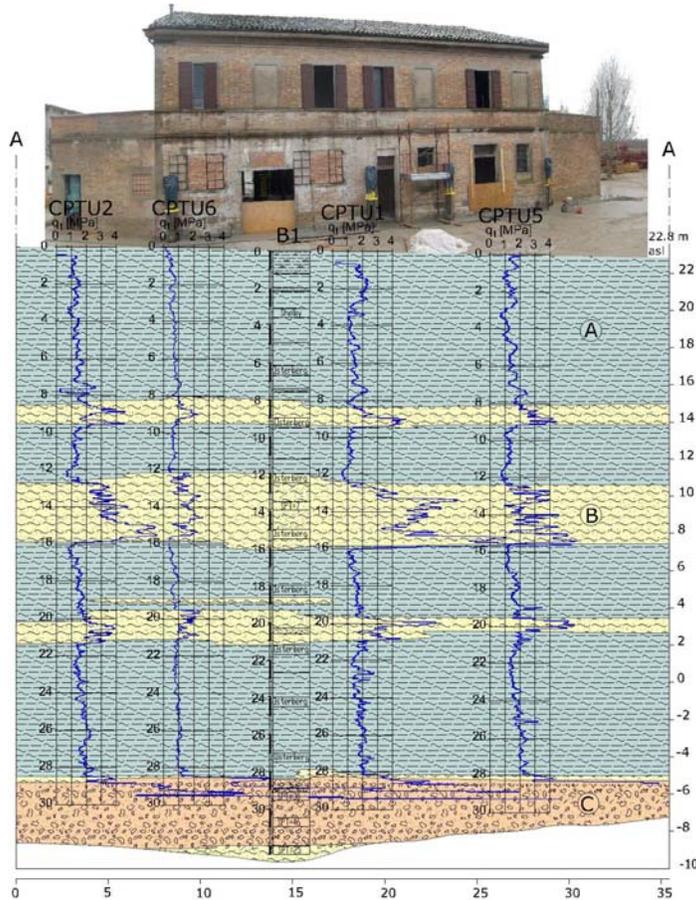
Schematic section (A-A in Figure 3) of the subsoil, from the in-situ testing logs and view of the building.
